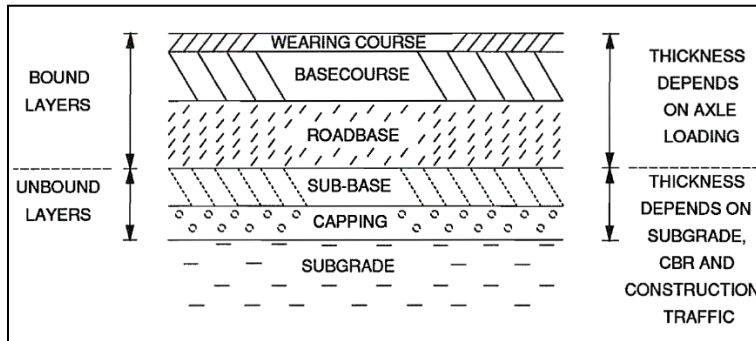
Road pavement structure (O'Mahony, 1990)
